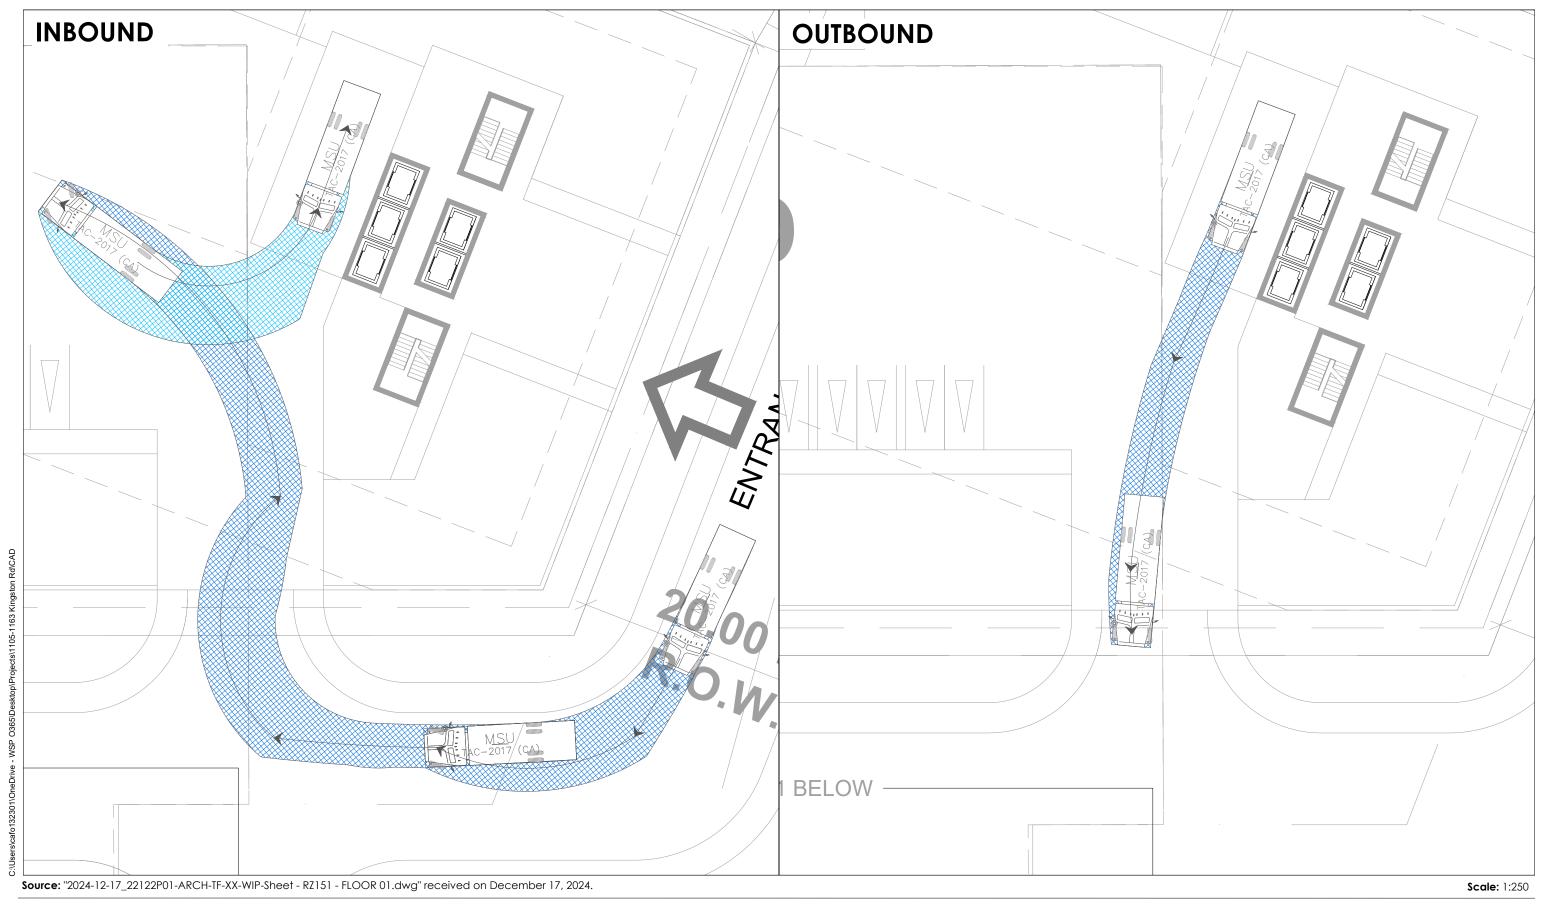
MSU Loading Truck Turning Maneuver - Building C 1105-1163 Kingston Road, Pickering
